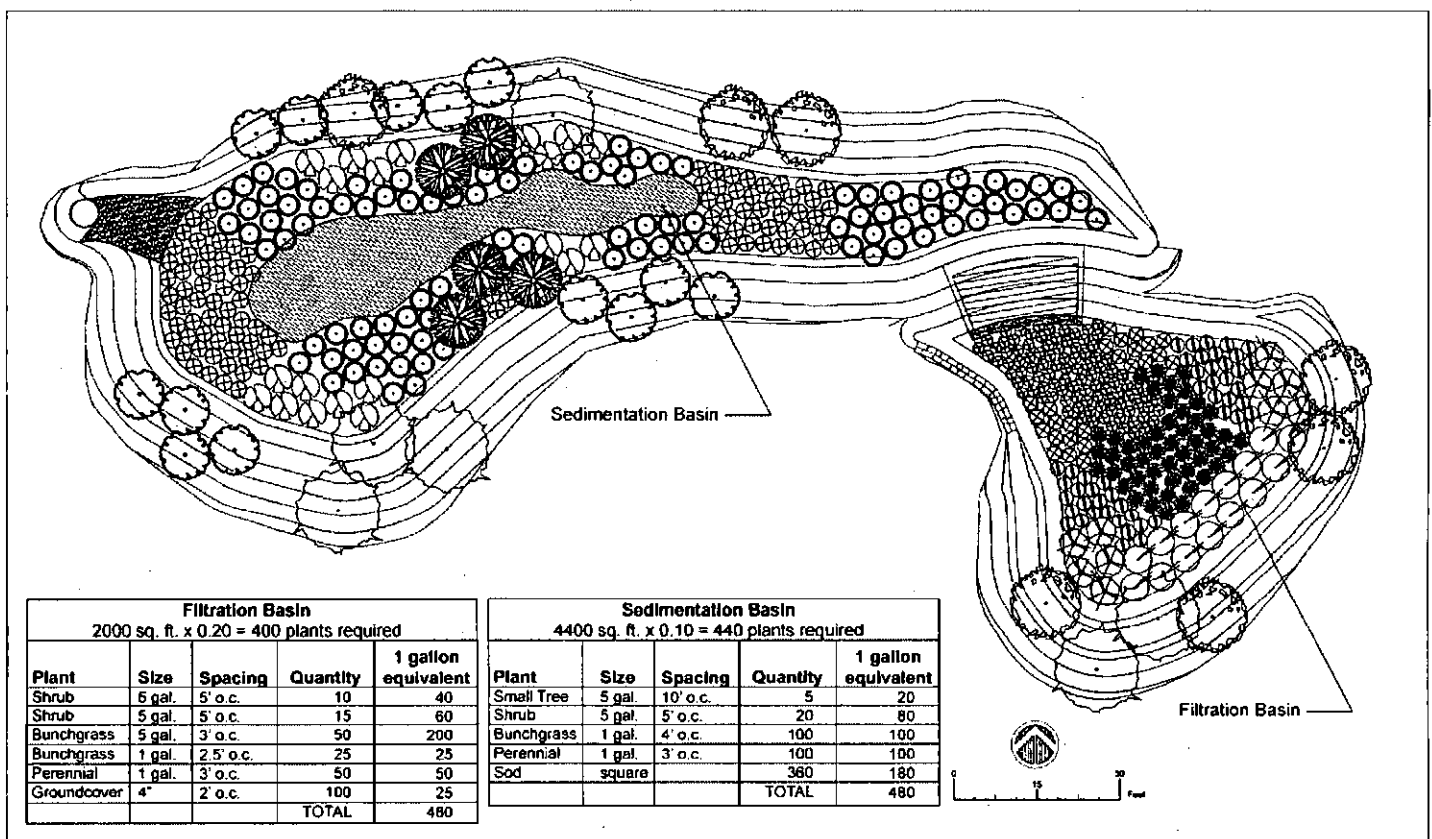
C-4: Example of Biofiltration Landscape Layout and Calculations
